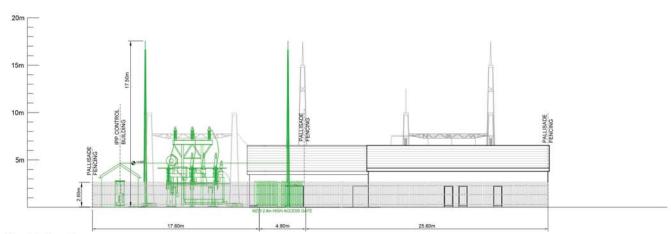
Elevation of the additional plant and apparatus in the existing Woodhouse Substation
